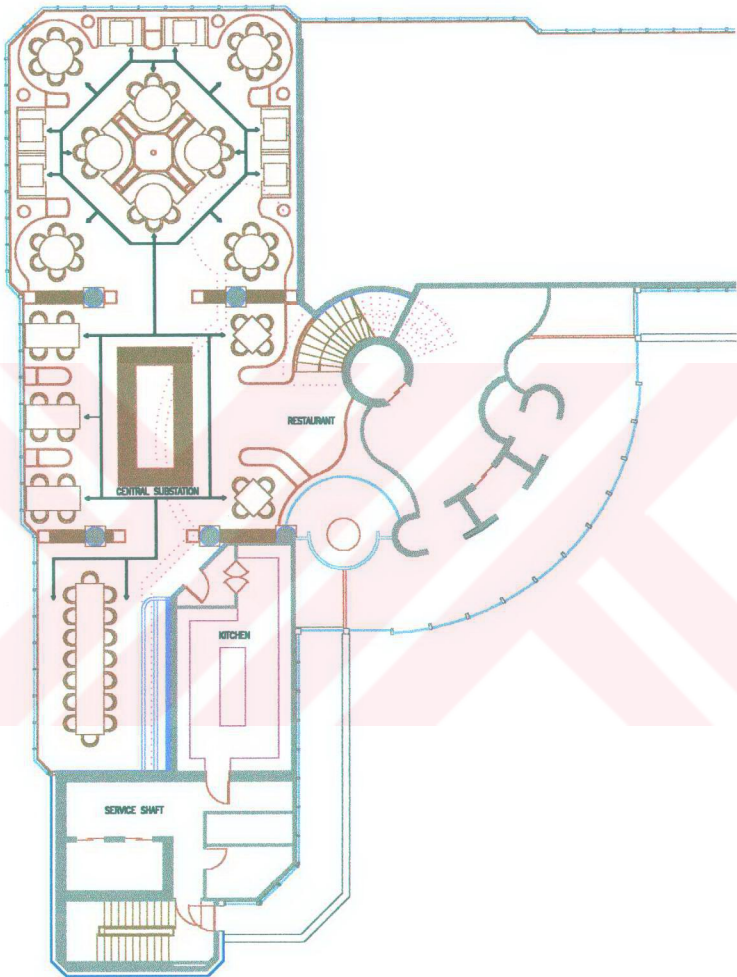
Restaurant level plan showing system of service lanes & substations. Scale: 1/200.
